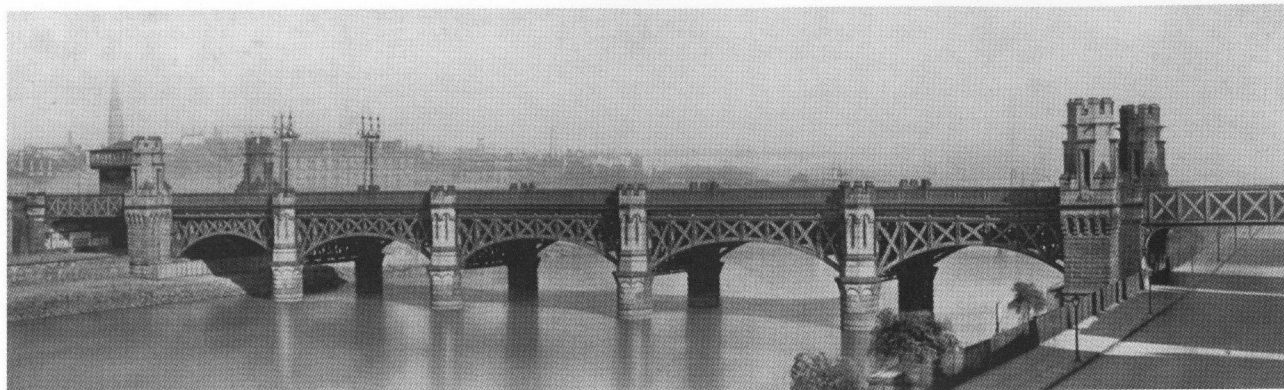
View of the Union Railway Bridge, Glasgow, c.1900, for which Arrol completed the steelwork (B91887/PO, item 64).
